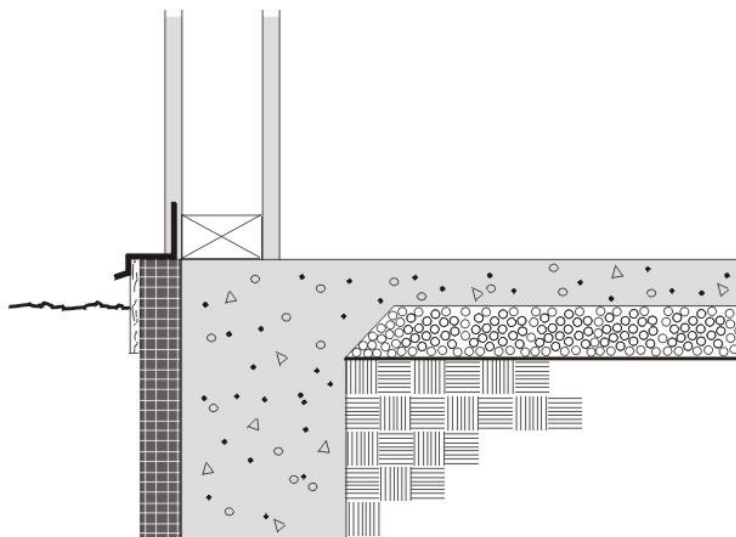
Unheated Slab-on-Grade Floor
